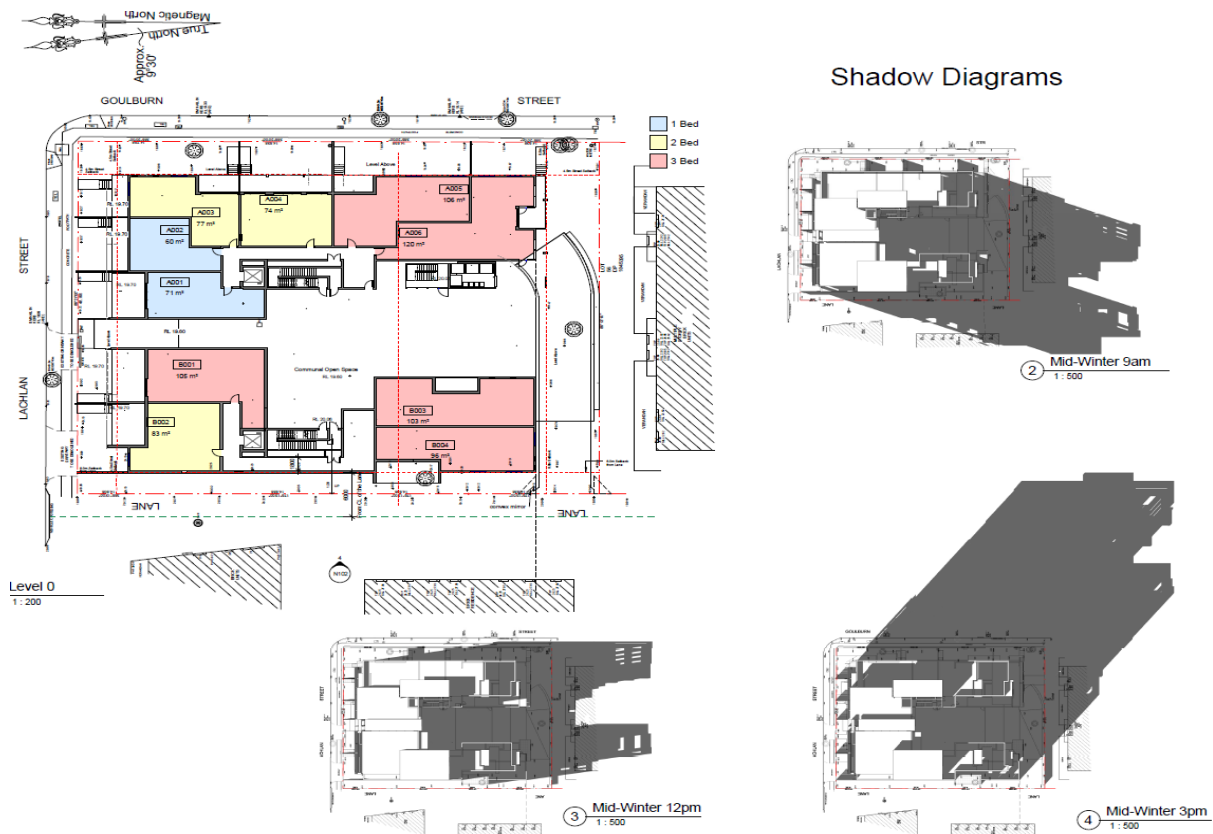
View of an alternative scheme re-orienting the building to face Lachlan St, showing the ground level building layout and shadows cast by the building at 9am, 12noon and 3pm in mid-winter.
